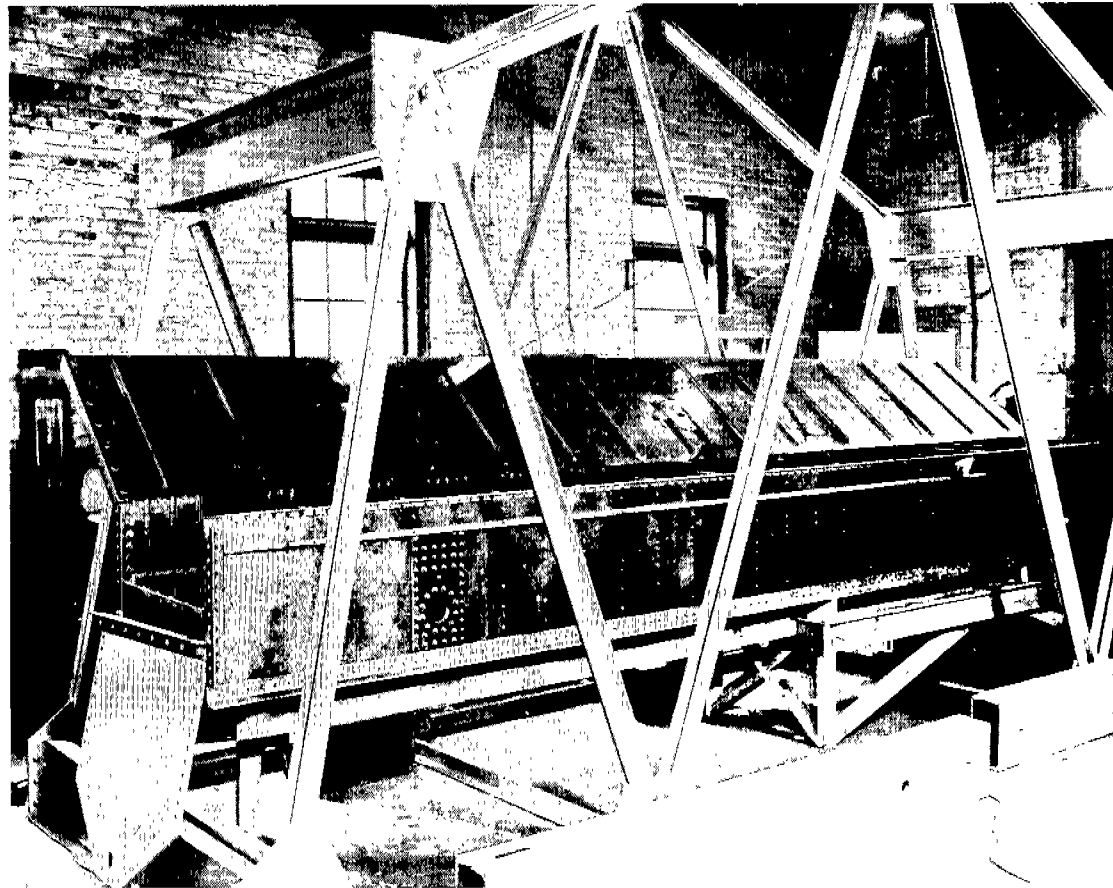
ASSEMBLY - BOTTOM STRUCTURE
